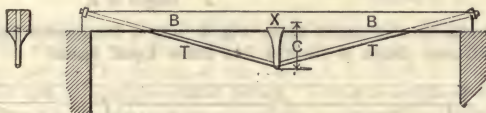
Trussed Wooden Girder. One Vertical Strut
